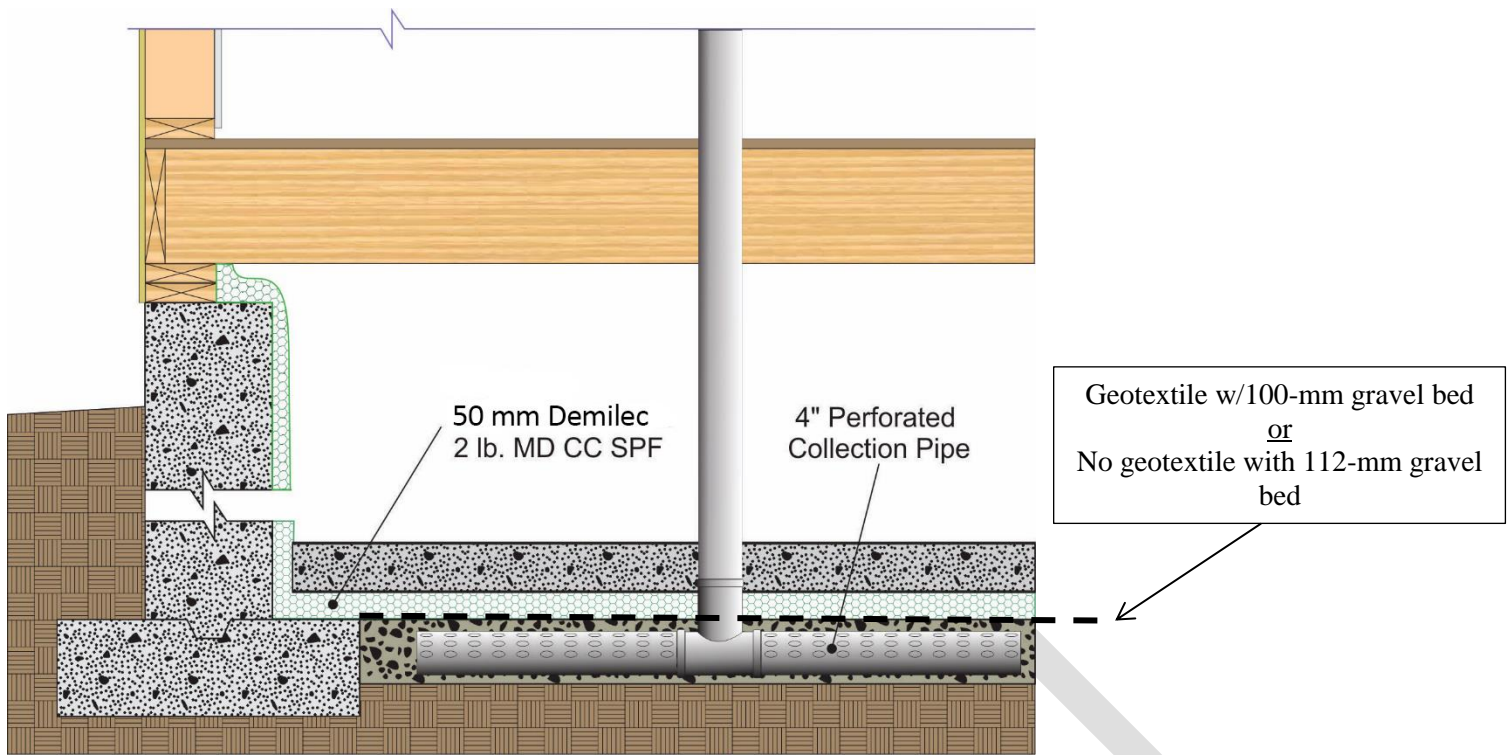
Application of CUFCA RCST™ beneath concrete slab, with geotextile/100 mm gravel or without geotextile/112 mm gravel bed.
